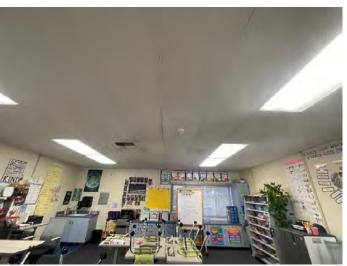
Classroom 74 - no visible evidence of significant water intrusion/damage
